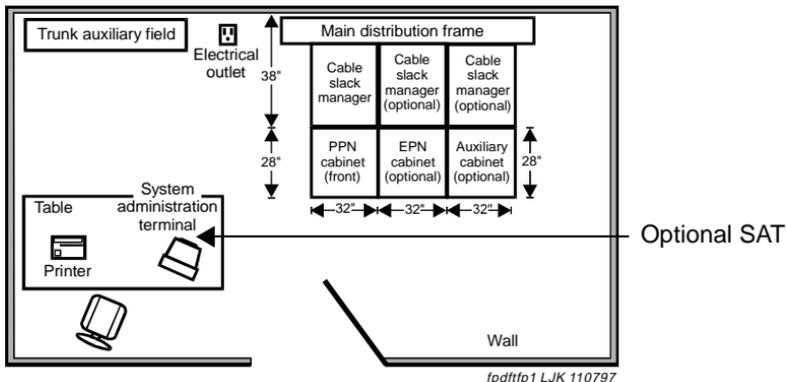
Typical Floor Plan with EPN and Auxiliary Cabinet
